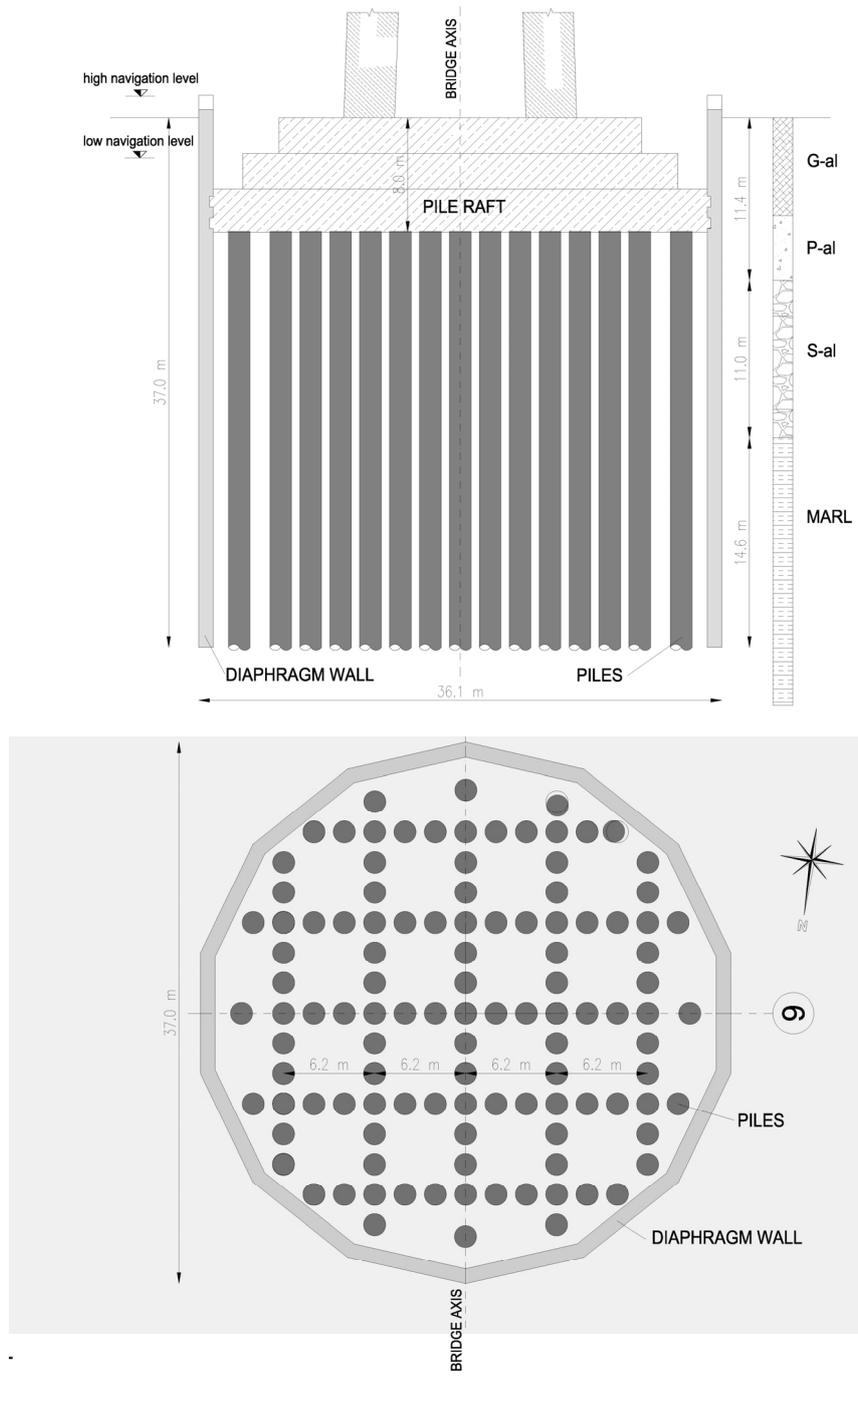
Foundation layout at pier 6 (pylon foundation).
